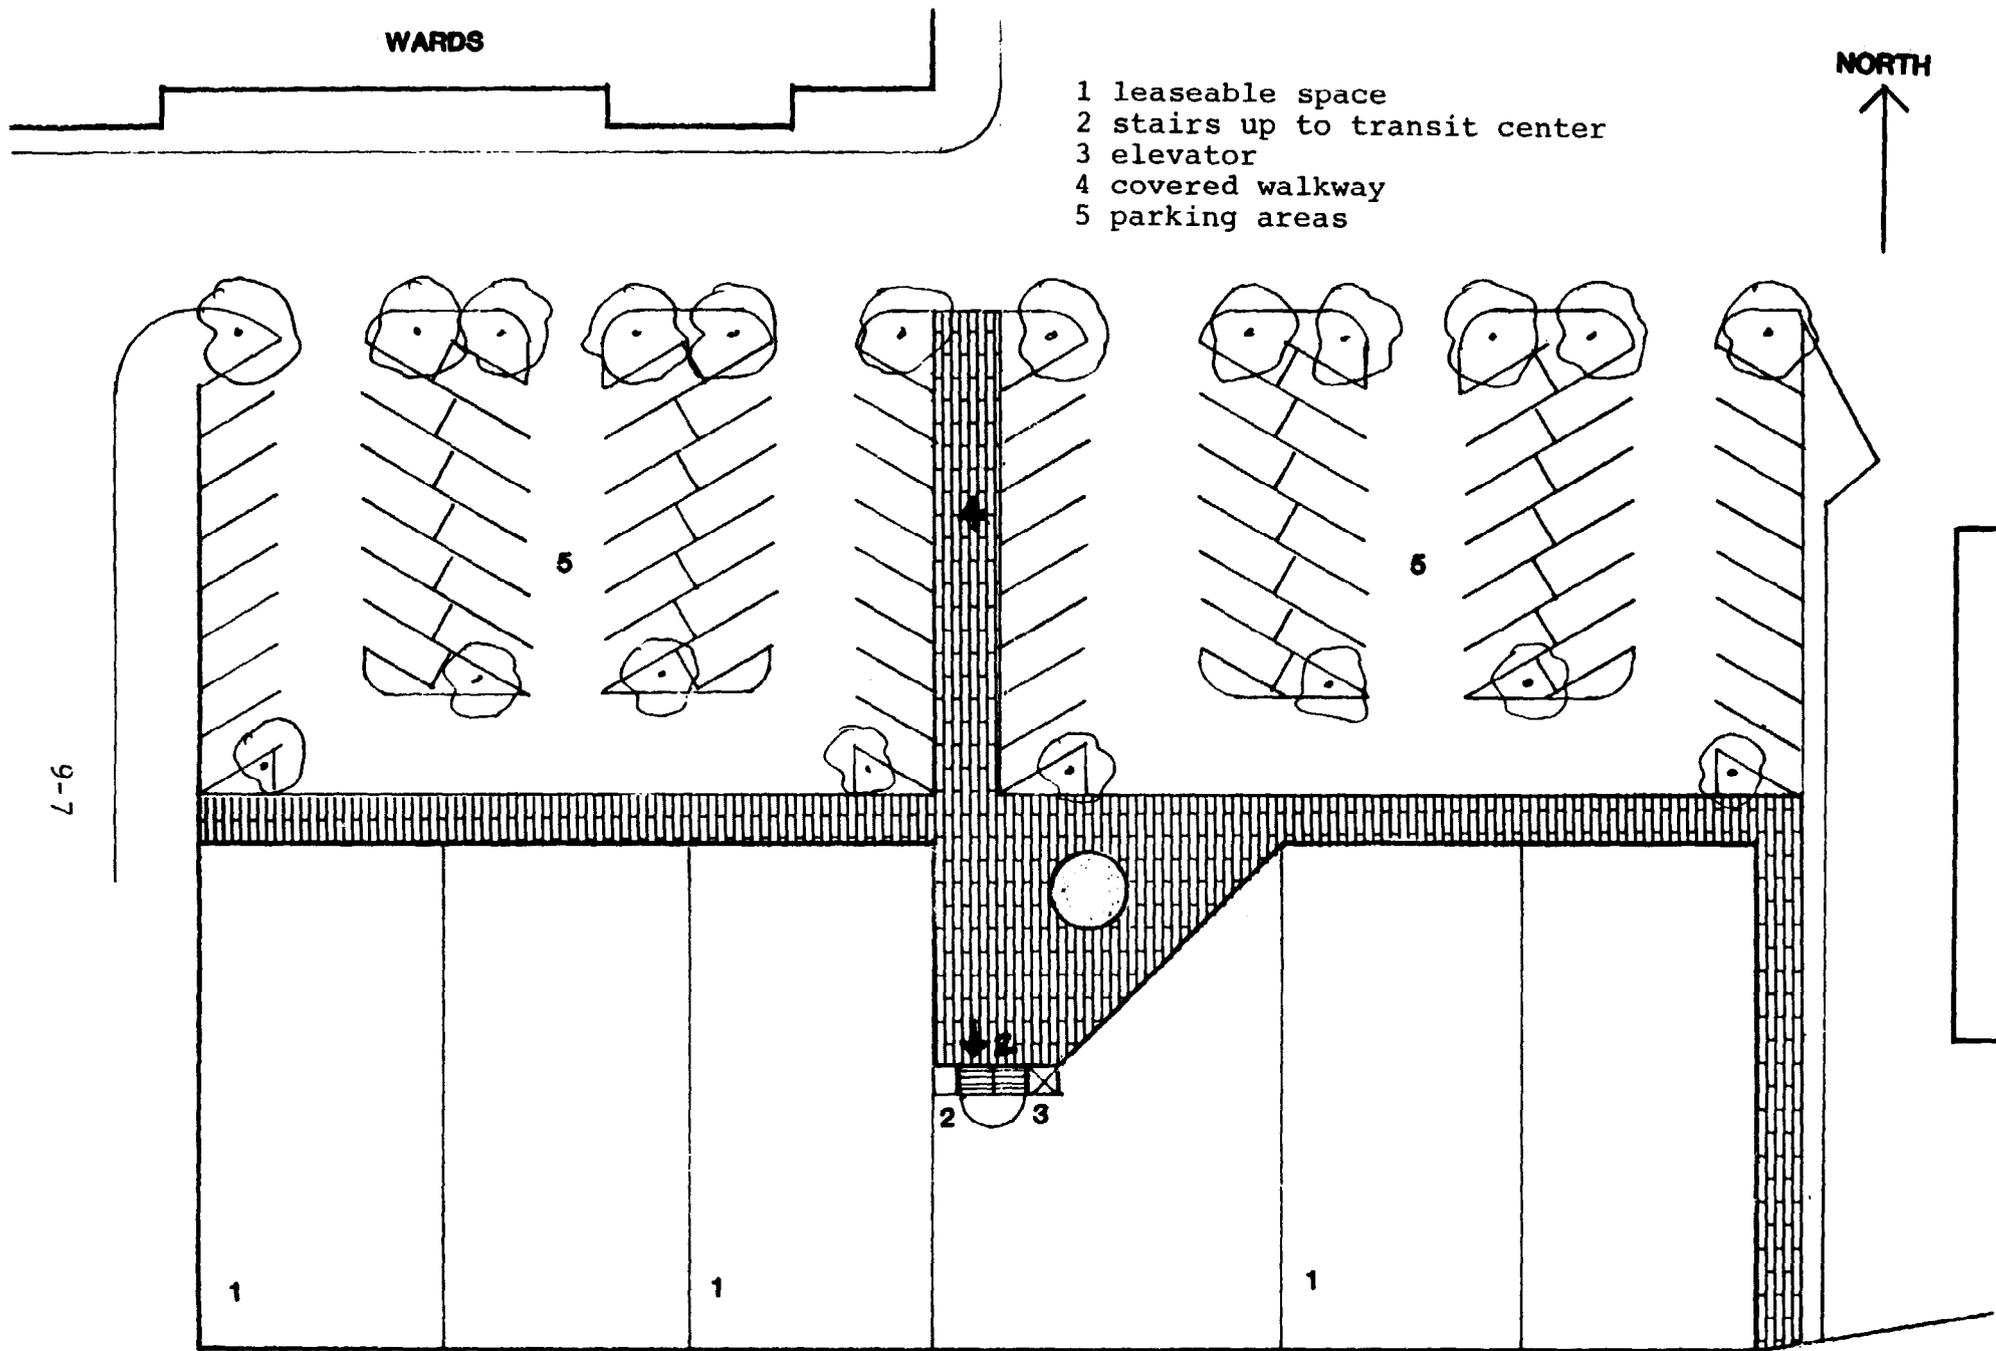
Proposed Transit Center - Lower Level Floor Plan (conceptual design only)
